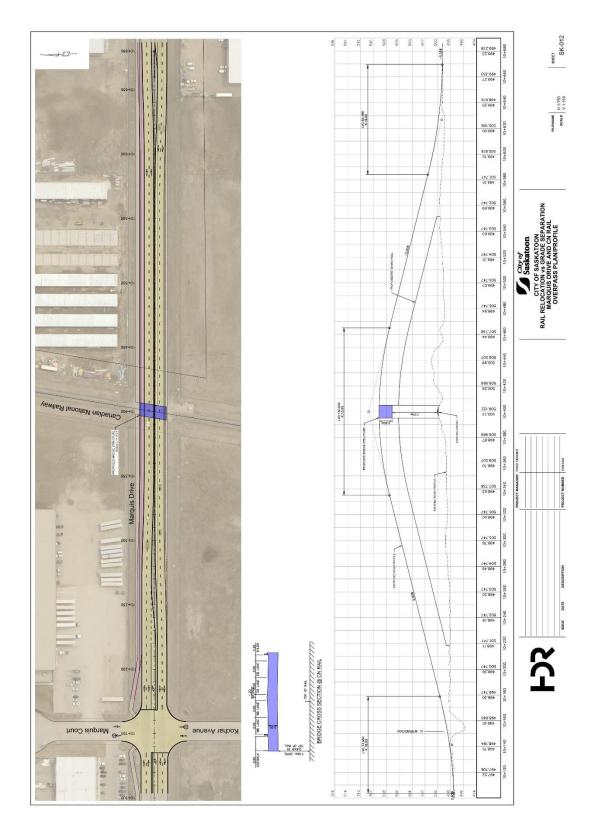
Proposed Conceptual Plan and Profile for Marquis Drive @ CN
